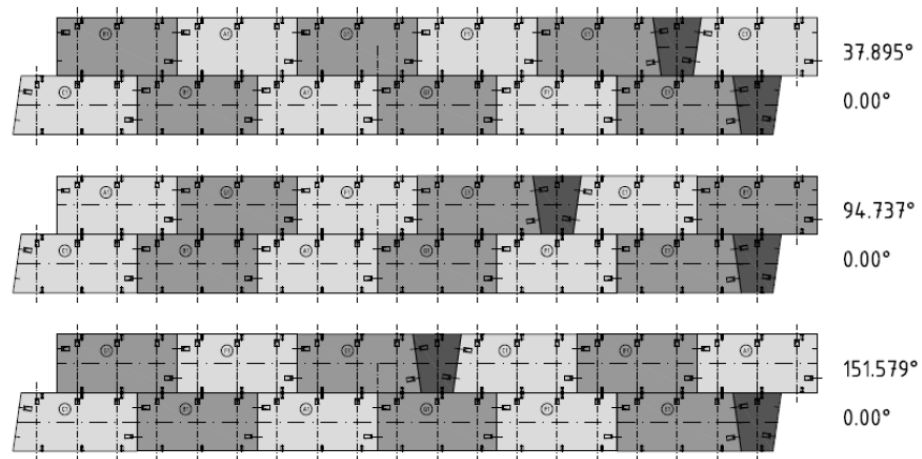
TBM tunnel allowed rotations in rectangular precast segment. Cross Joint
